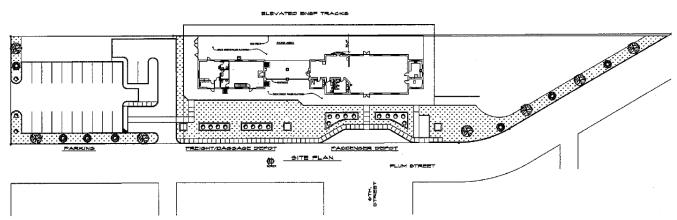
Site Plan, Burlington Depot, 2002. Webb & Co. Architects
